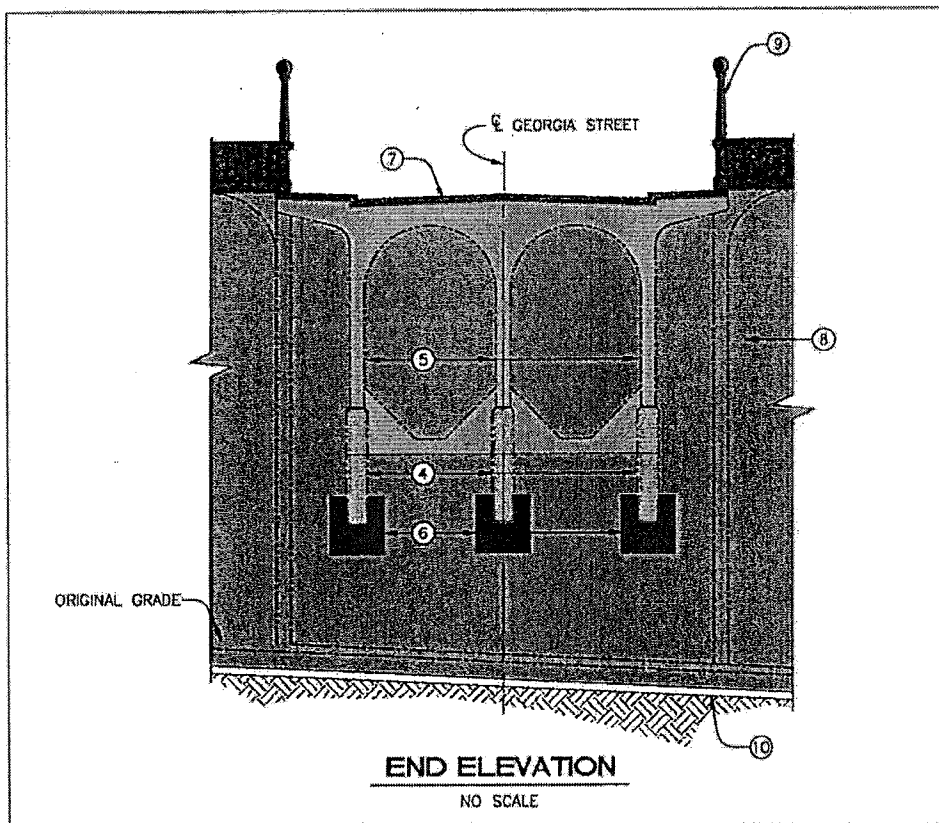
End elevation diagram of preferred bridge alternative #1. Simon Wong Engineering
